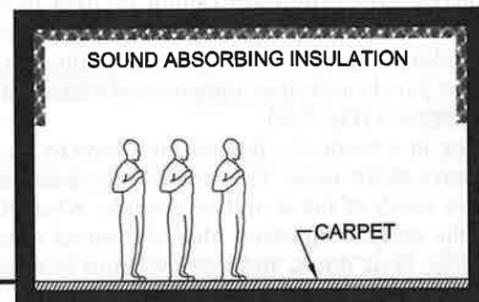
If the ceiling and floor are not of sufficient area or are not available, the upper walls can be used for mounting sound-absorbing materials.
